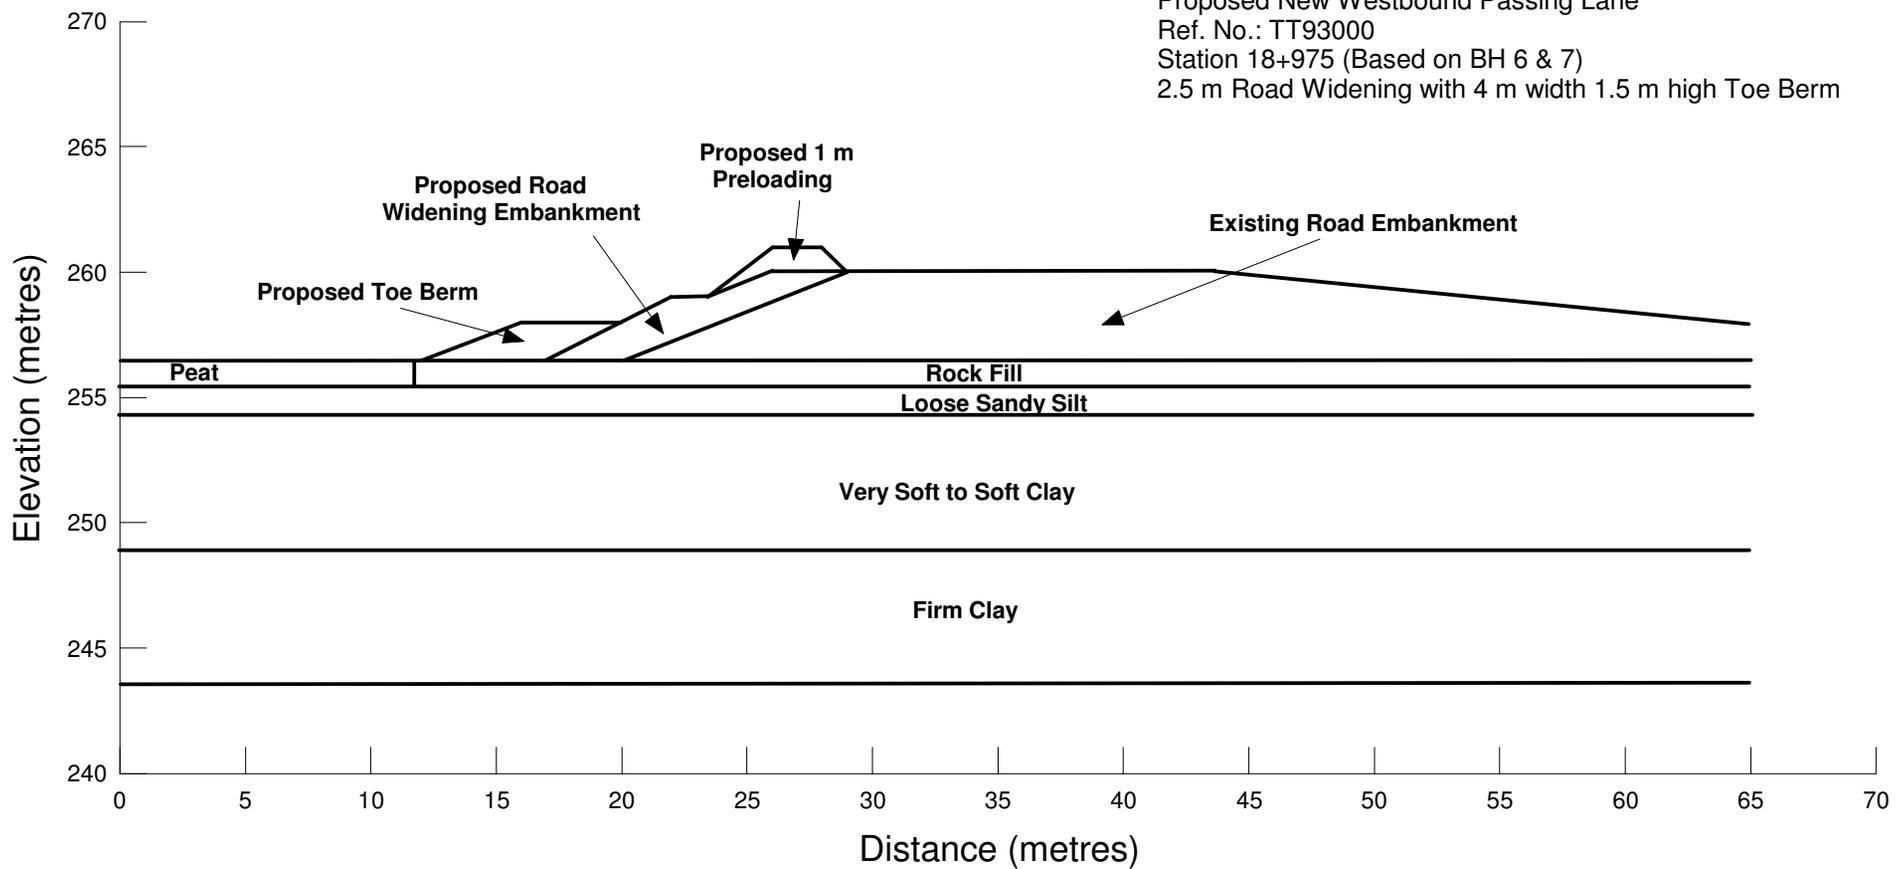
Embankment Configuration and Soil Profiles - Road Widening with 1 m Preloading at Station 18+975
